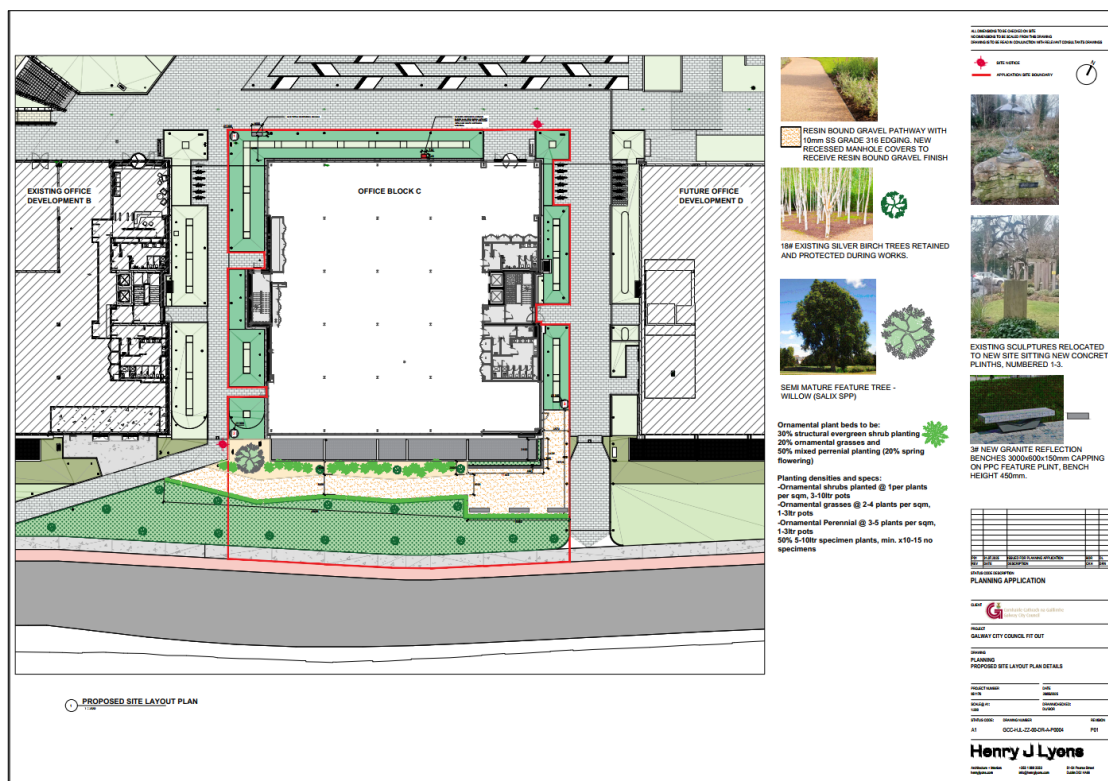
Site Plan with Area and Details of External Works Proposed Annotated. (Source: HJL Architects)
